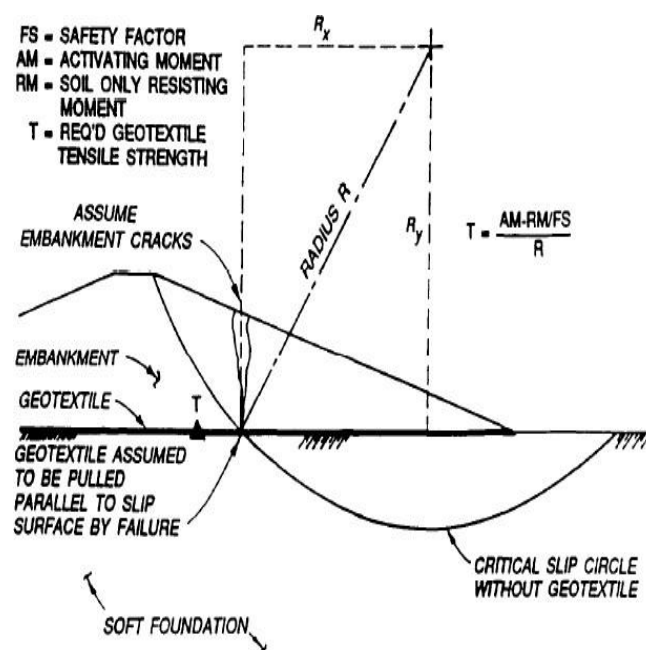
Concept used for determining geotextile tensile strength necessary to prevent slope failure
